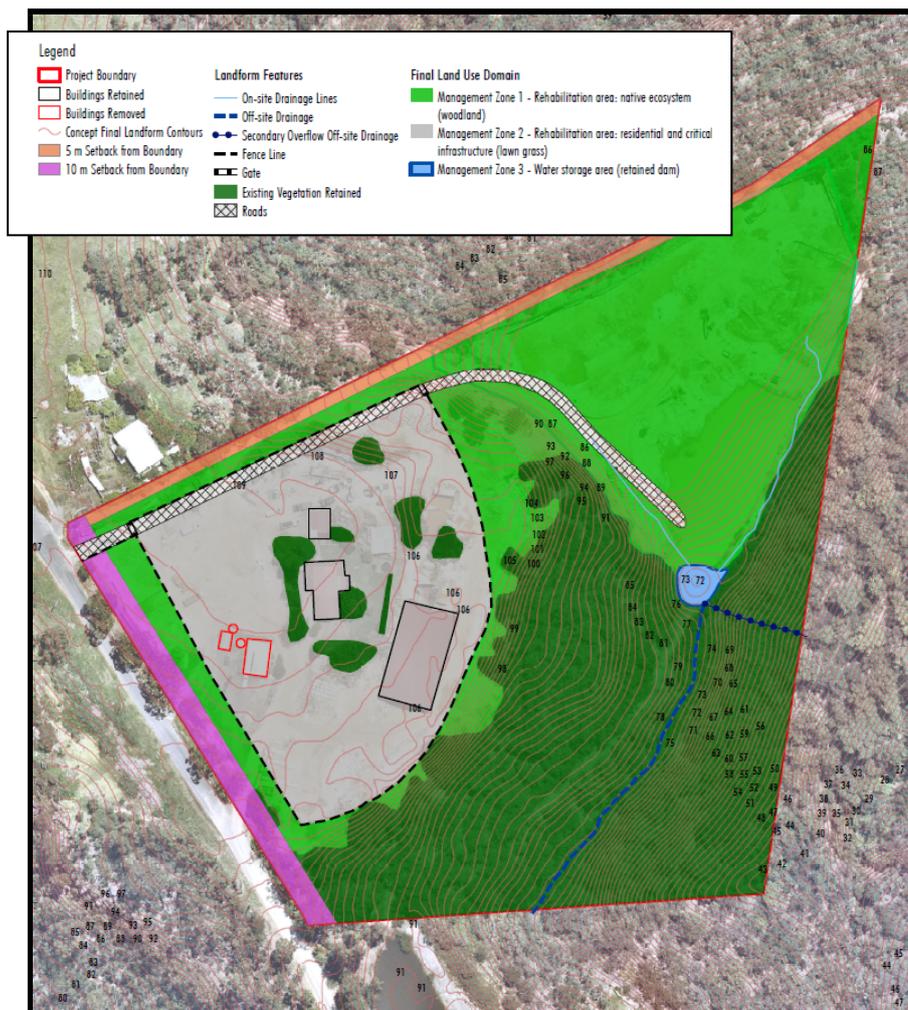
Rehabilitation Plan (Source: Figure 3.1 of Rehabilitation Plan, Umwelt, May 2023)
